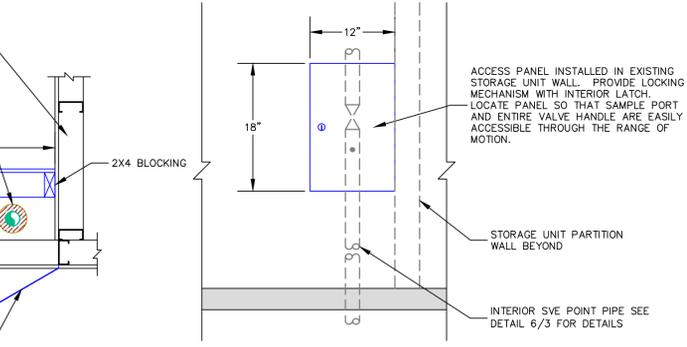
SVE POINT VALVE ACCESS PANEL
